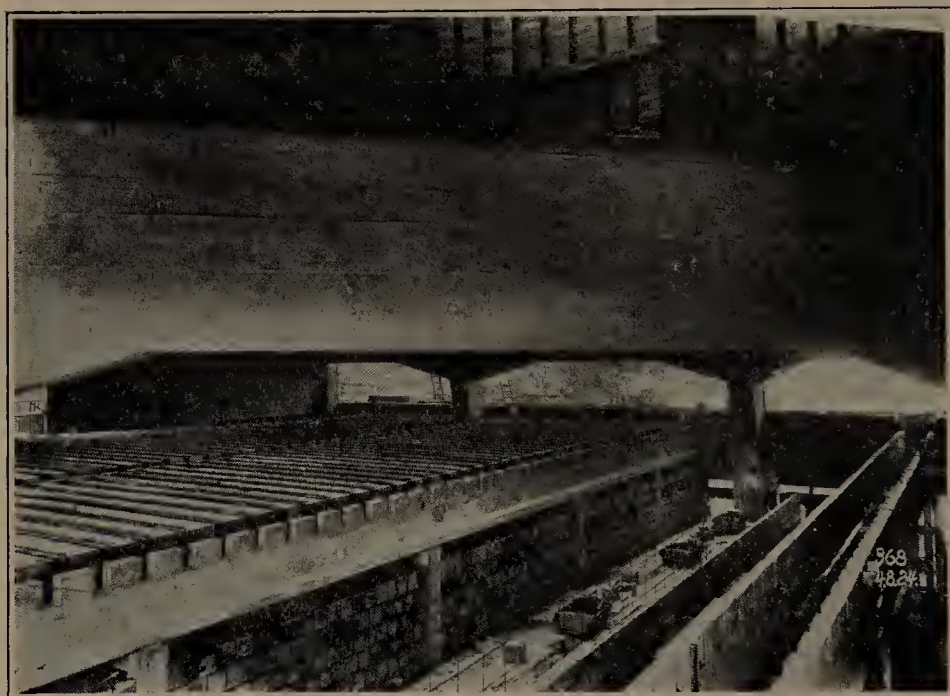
CONCRETE AND TILE COOLING UNIT OF THE CONCRETE COOLING TOWER AT TRATTENDORF
